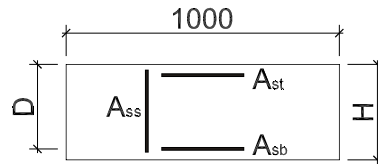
Cross-section of reinforced concrete slab (dimensions [mm]).
